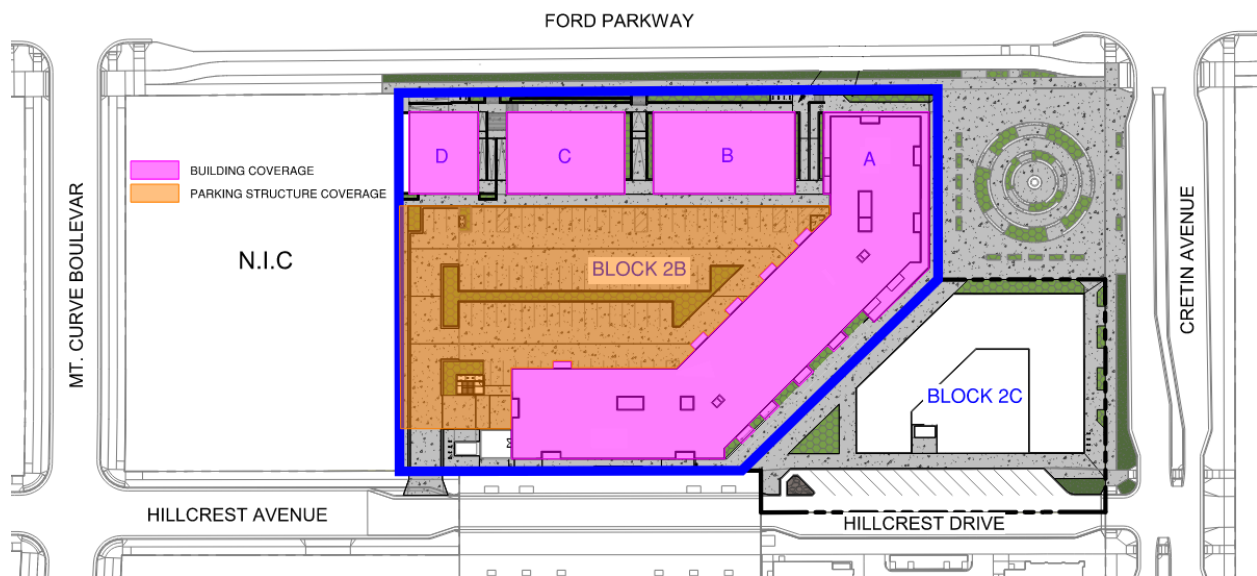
Highland Bridge Block 2B Building Lot Coverage
